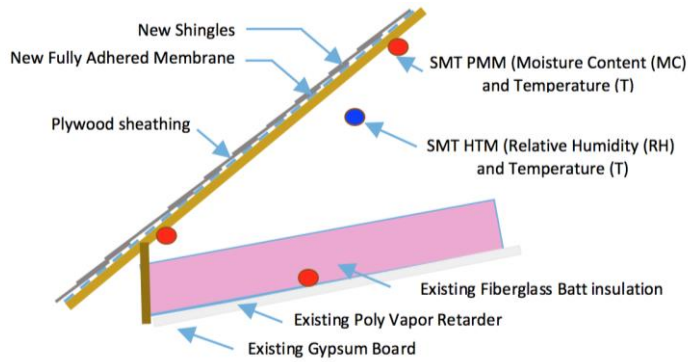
Roof Area 4 & 5 - Vented Dormer Extensions with cold attic space
